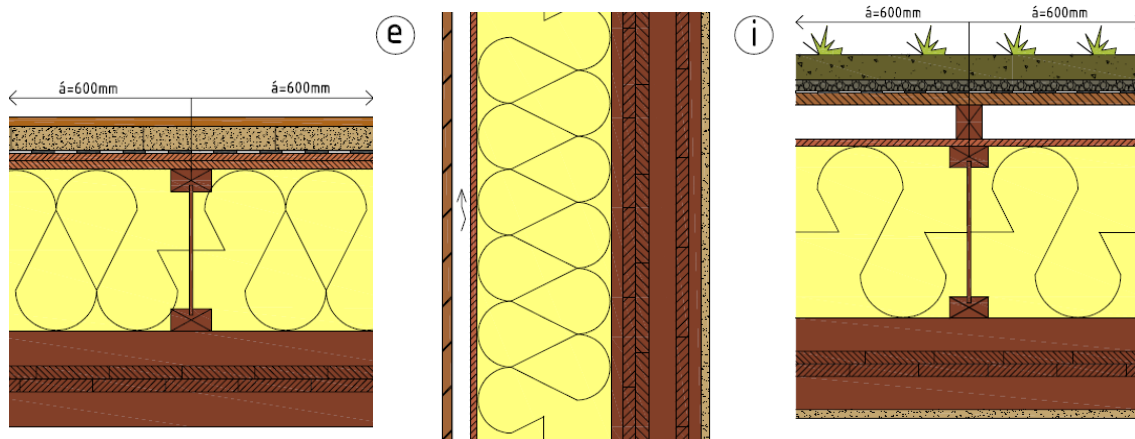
Scheme of material composition of floor structure 4F, exterior wall 4W and roof structure 4F.
